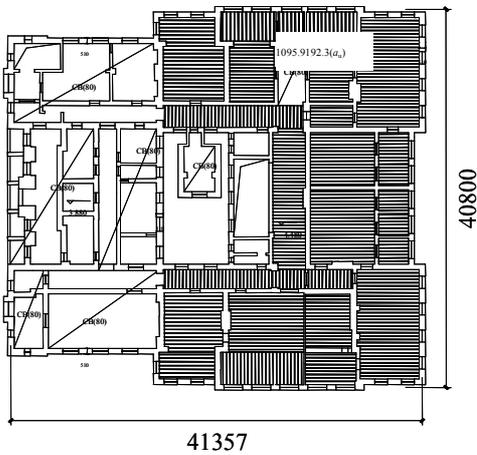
Structural plane of the 2<sup>nd</sup> storey
